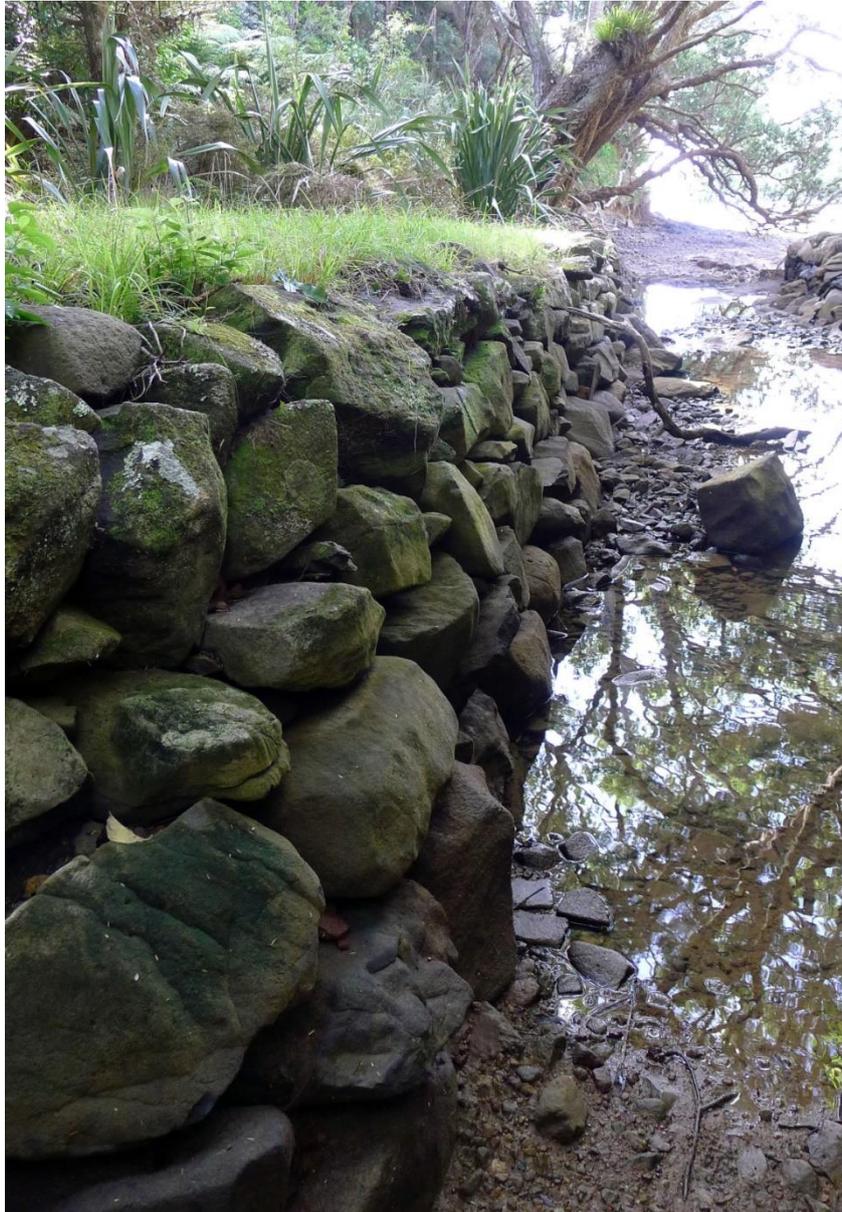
Western retaining wall at the bake house site. (Auckland Council March 2018).
